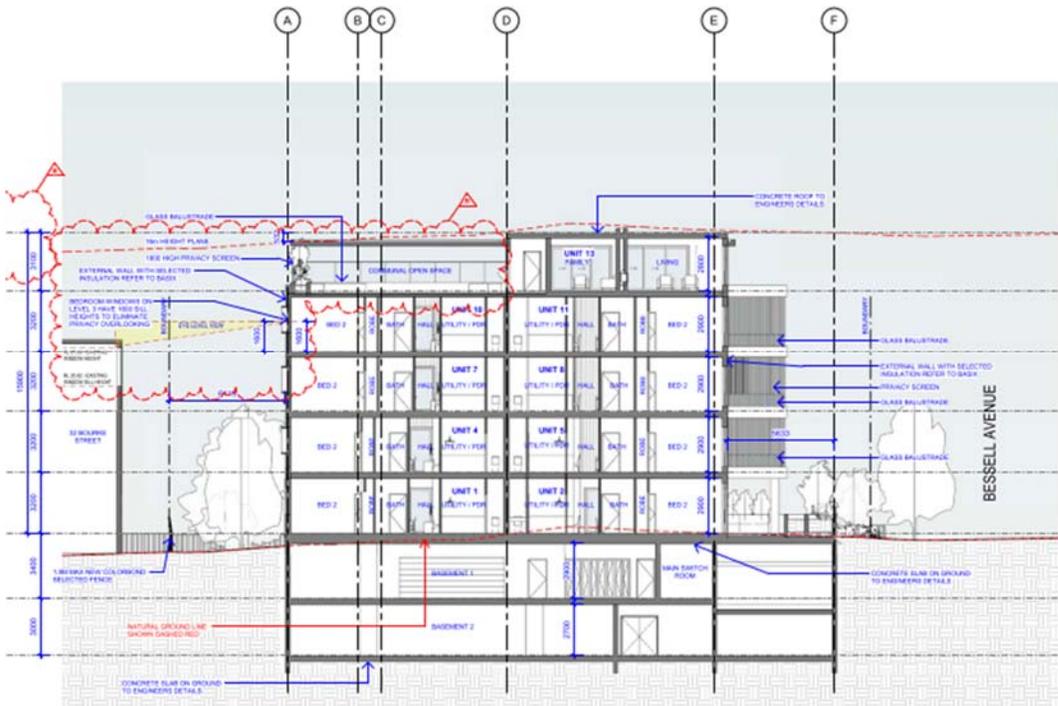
Section B-B of the proposed Development (*Source: PRD Architecture)
